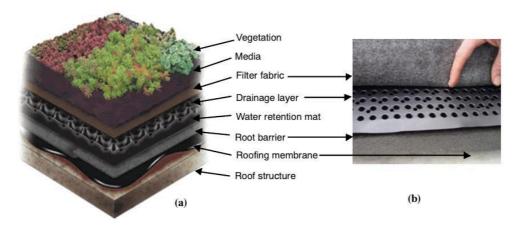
(a) Profile of a typical green roof (graphic courtesy of American Hydrotech, Inc.), and (b) filter fabric, drainage layer, and root barrier. (Hathaway, Hunt, & Jennings, 2008, p. 38) Photo credit American Hydrotech, Inc.
